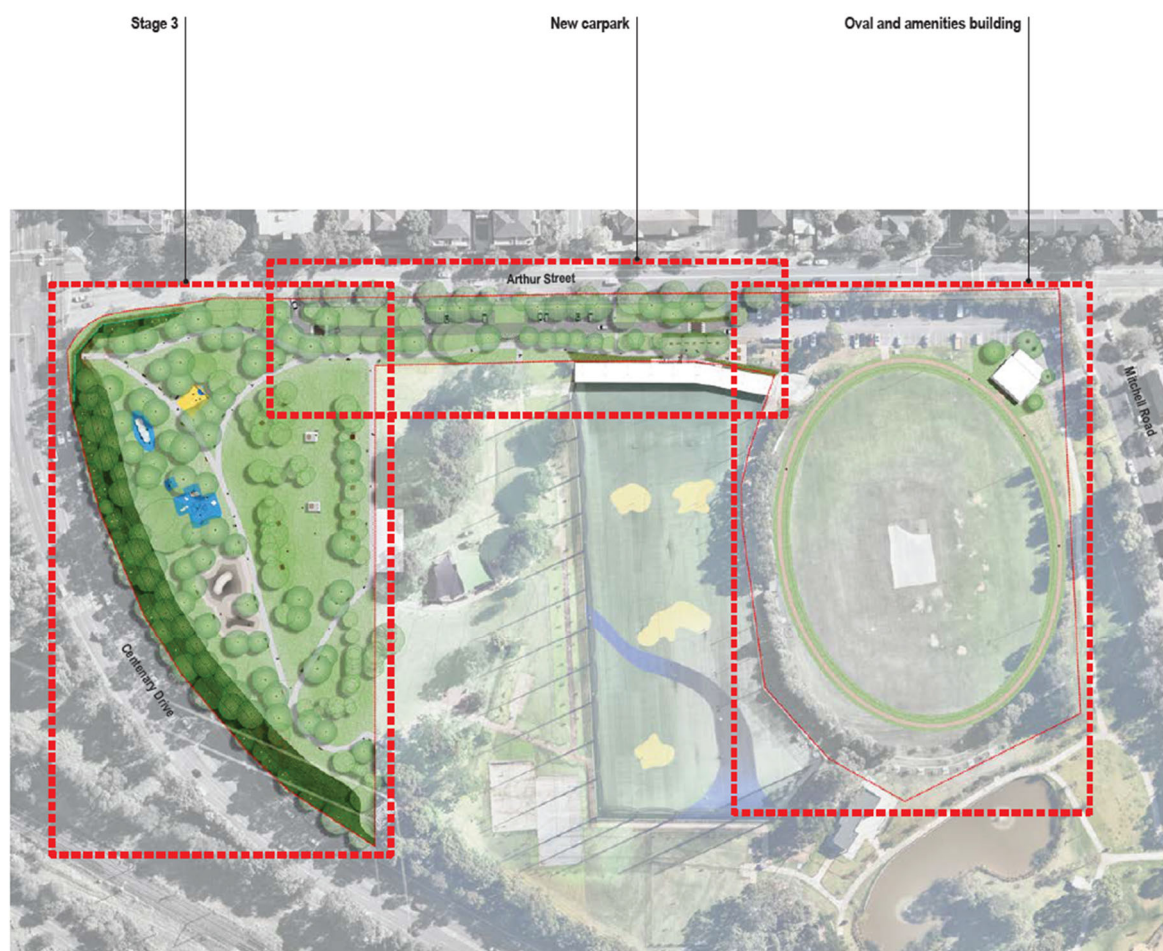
Location of proposed stage 3 works on Hudson Park East (near Arthur Street at north and Centenary Drive at west)
